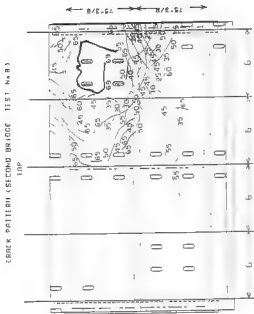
Top Cracking Pattern (Second Bridge - Test No 8)
